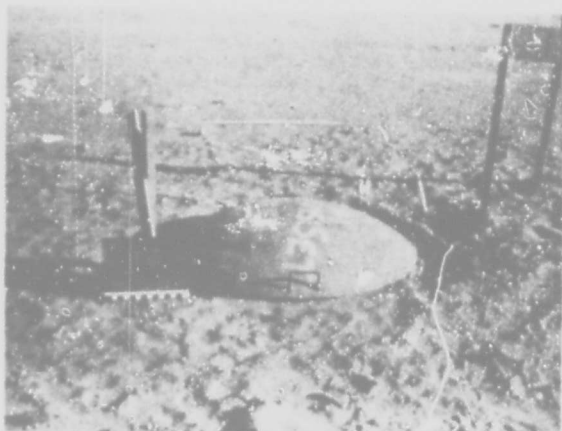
Installation with Lid in Place, Prior to Placing Protective Earth Fill
